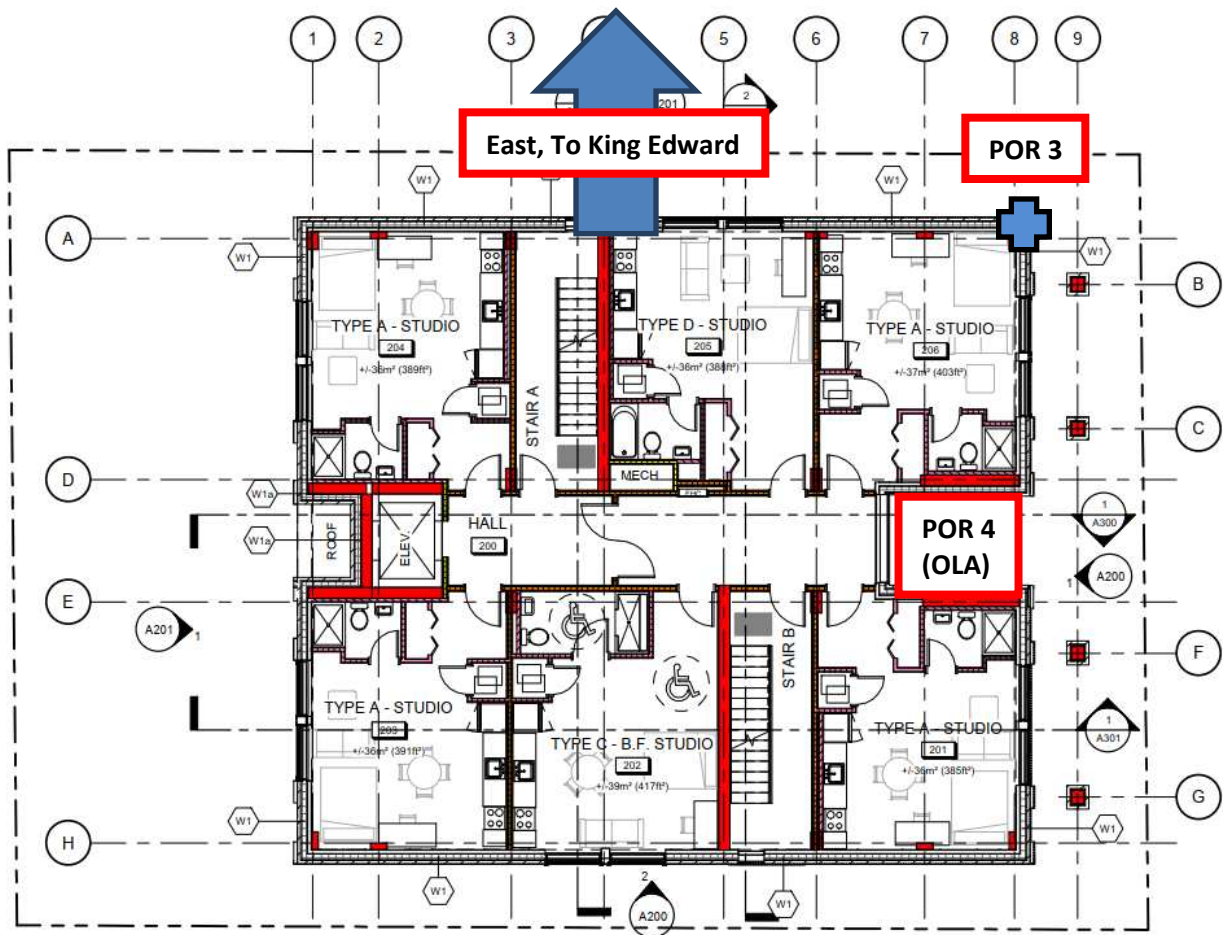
2nd floor plan view showing POR 3 and POR 4
